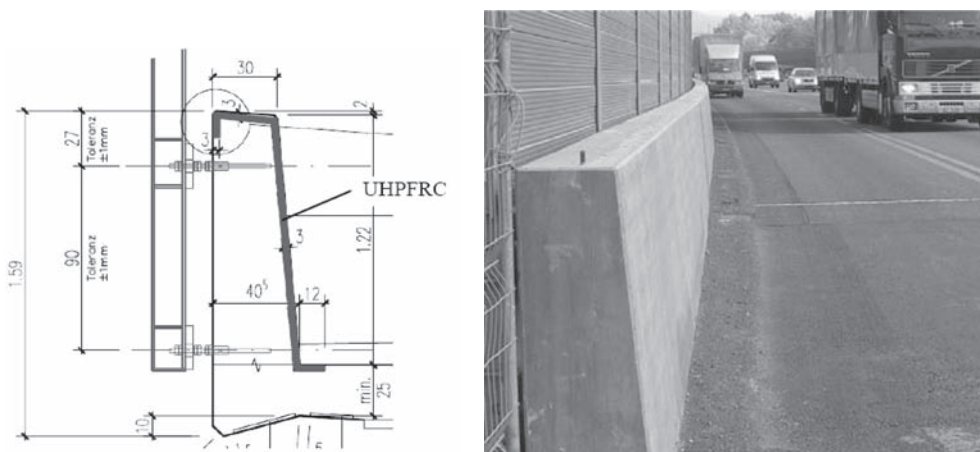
Typical cross section of the crash barrier wall and view after rehabilitation.
